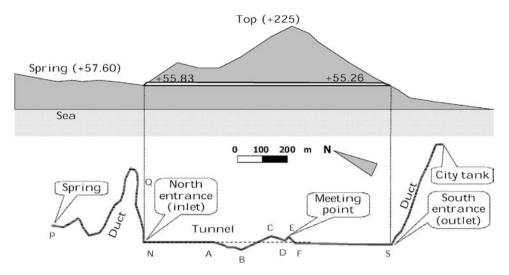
Sketch of the Tunnel of Eupalinos (above: vertical section; below: horizontal plan).
